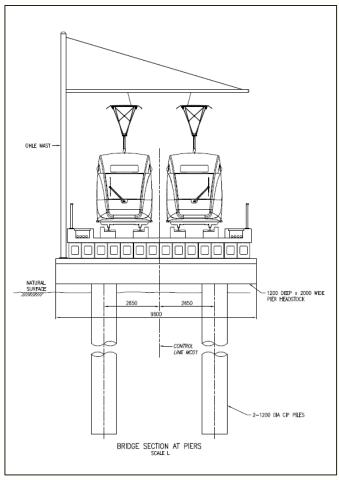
General cross-section view of the Biggera Creek Bridge Crossing
